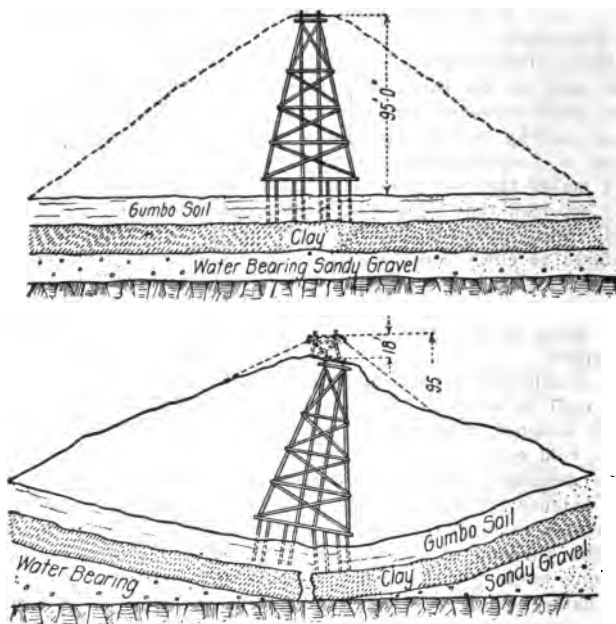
Section Through 95-Ft. Fill Showing Subsoil Strata Before and After Settlement.
